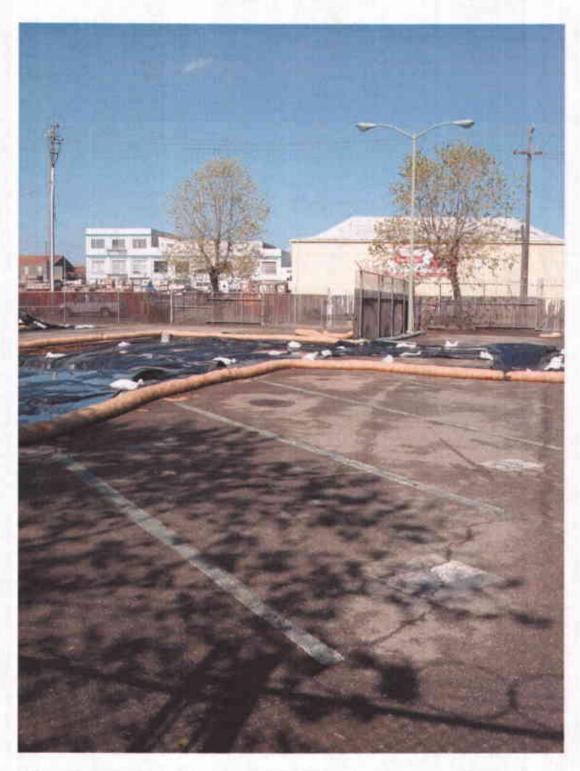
(4/20/2007) – Another view of the building pad excavation area. Equipment pad excavation is on the left side and the dispenser excavation is on the far right side of the photograph.
